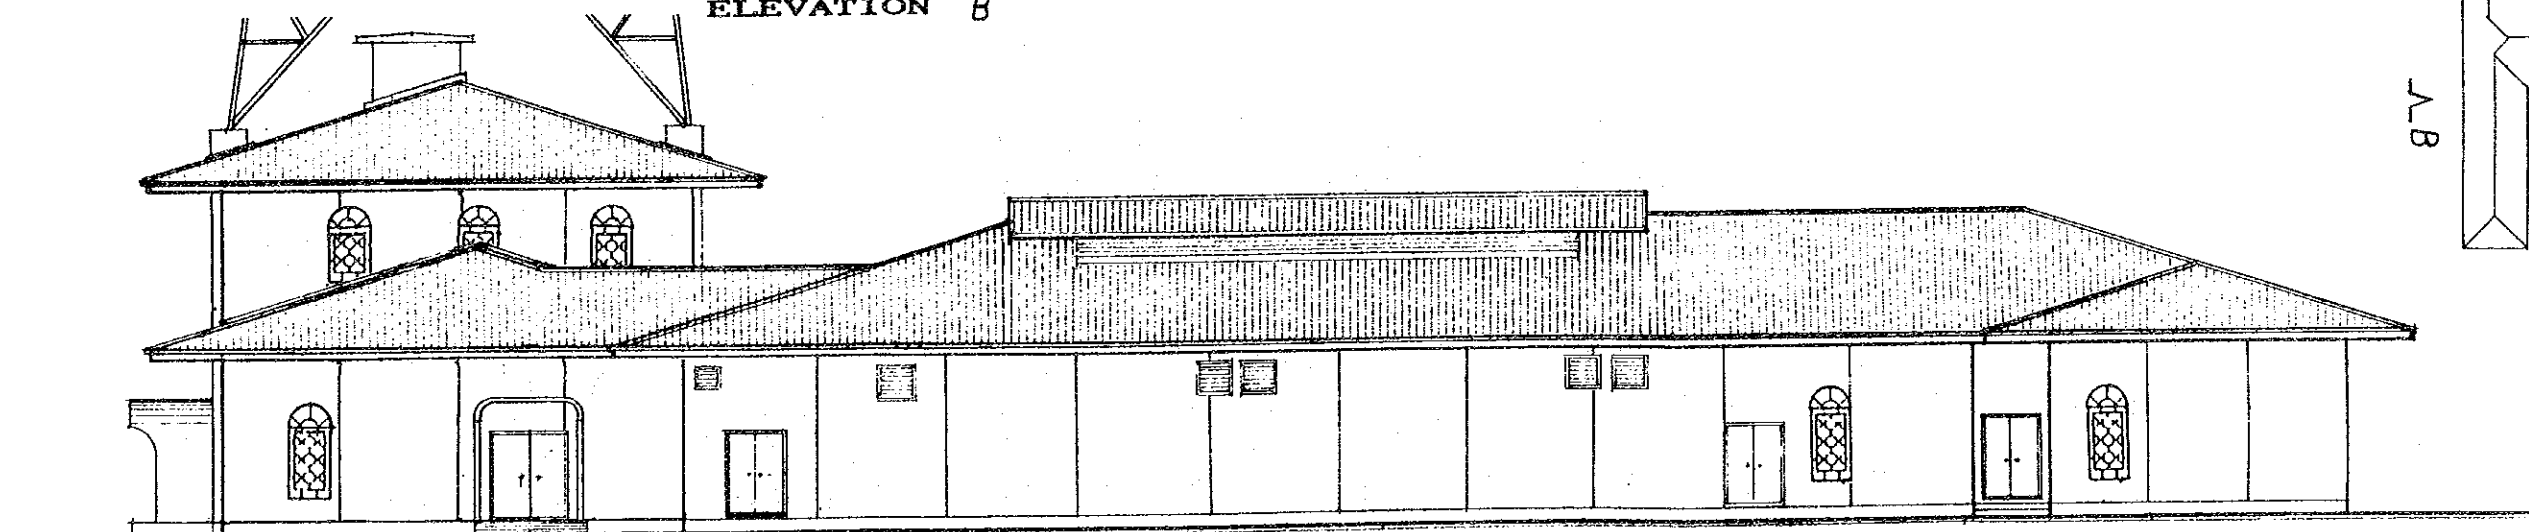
SLBC NEW STUDIO BUILDING
